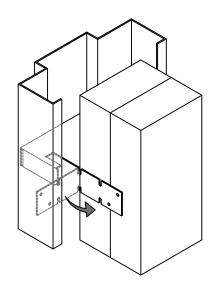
Snap or weld in anchors wood/ steel studs
